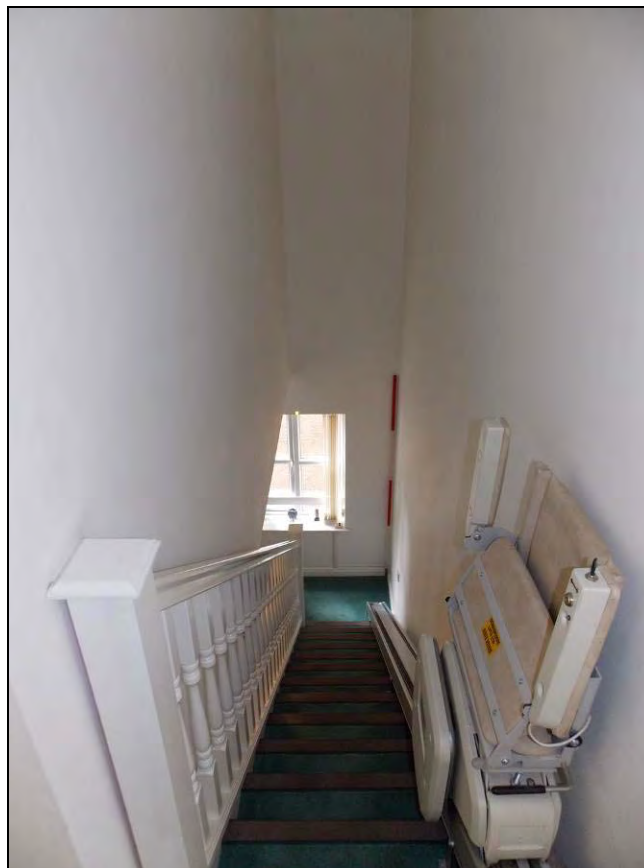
Staircase to the ground floor, looking south (scale 2m).
